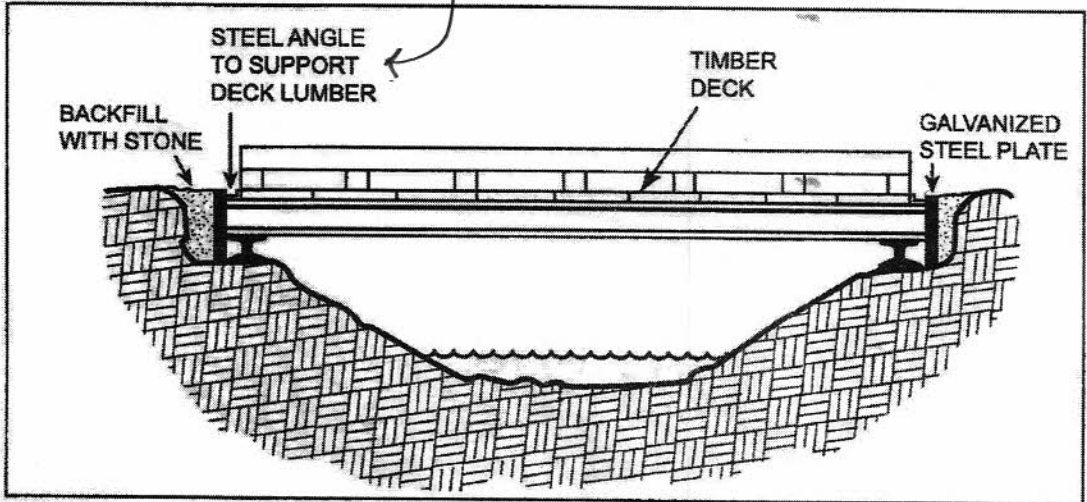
Side elevation section view of private bridge without concrete abutments
